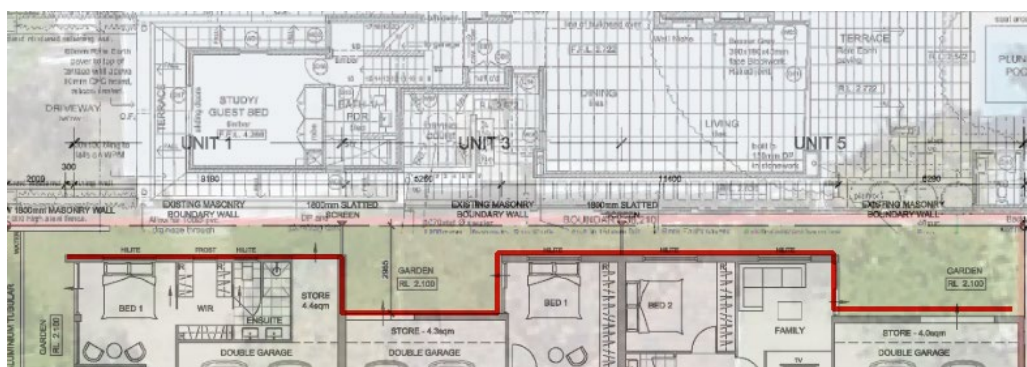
The floor plan for the second floor of Units 5 and 6 and its relationship with 49 Canning Beach Road.
